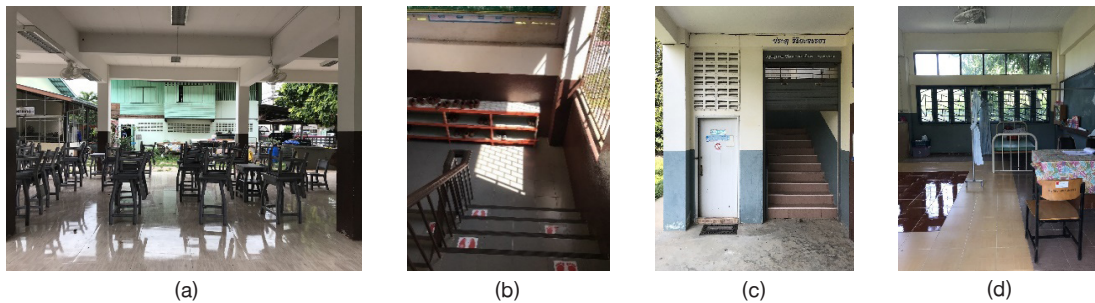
Extensions to Type C building: (a) 1st floor space with no wall turned into a new dining area; (b) stairs landing used as shoe storage; (c) additional toilet was installed underneath the stairs and (d) a classroom used as an infirmary.
